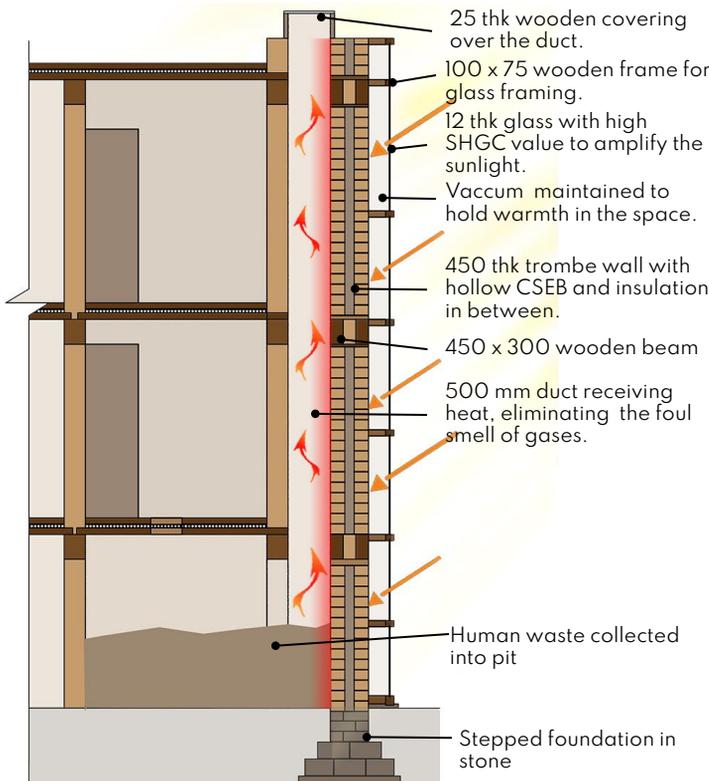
Detail section of dry toilet through trombe wall showing operation of duct.
